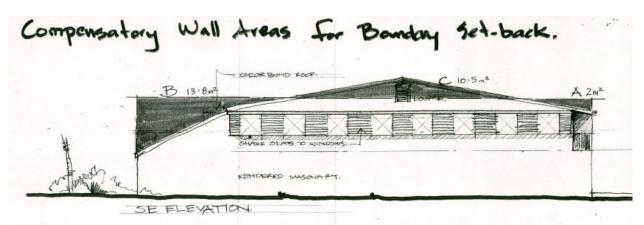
Identification of compensatory wall areas above and below a building height of 6.5m from existing ground levels.
